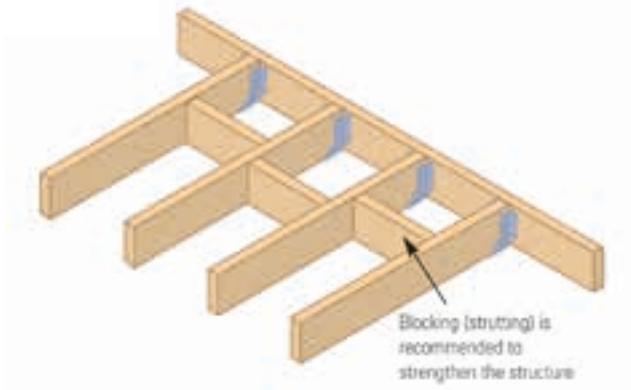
BEAM SPAN AND JOIST ARRANGEMENT
